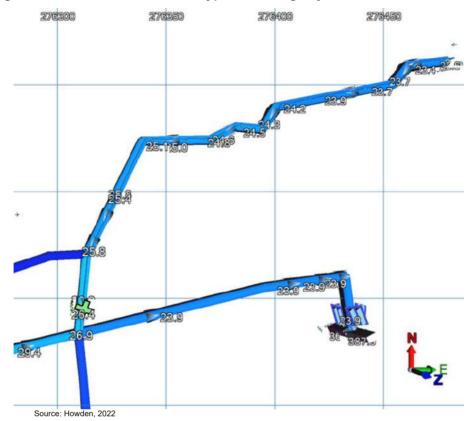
Isometric View of Typical Ducting Layout on a Level to Heading
